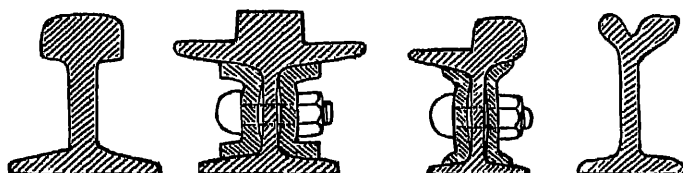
Sections of Tee rail, centre and side bearing girder rail, and grooved girder rail.
